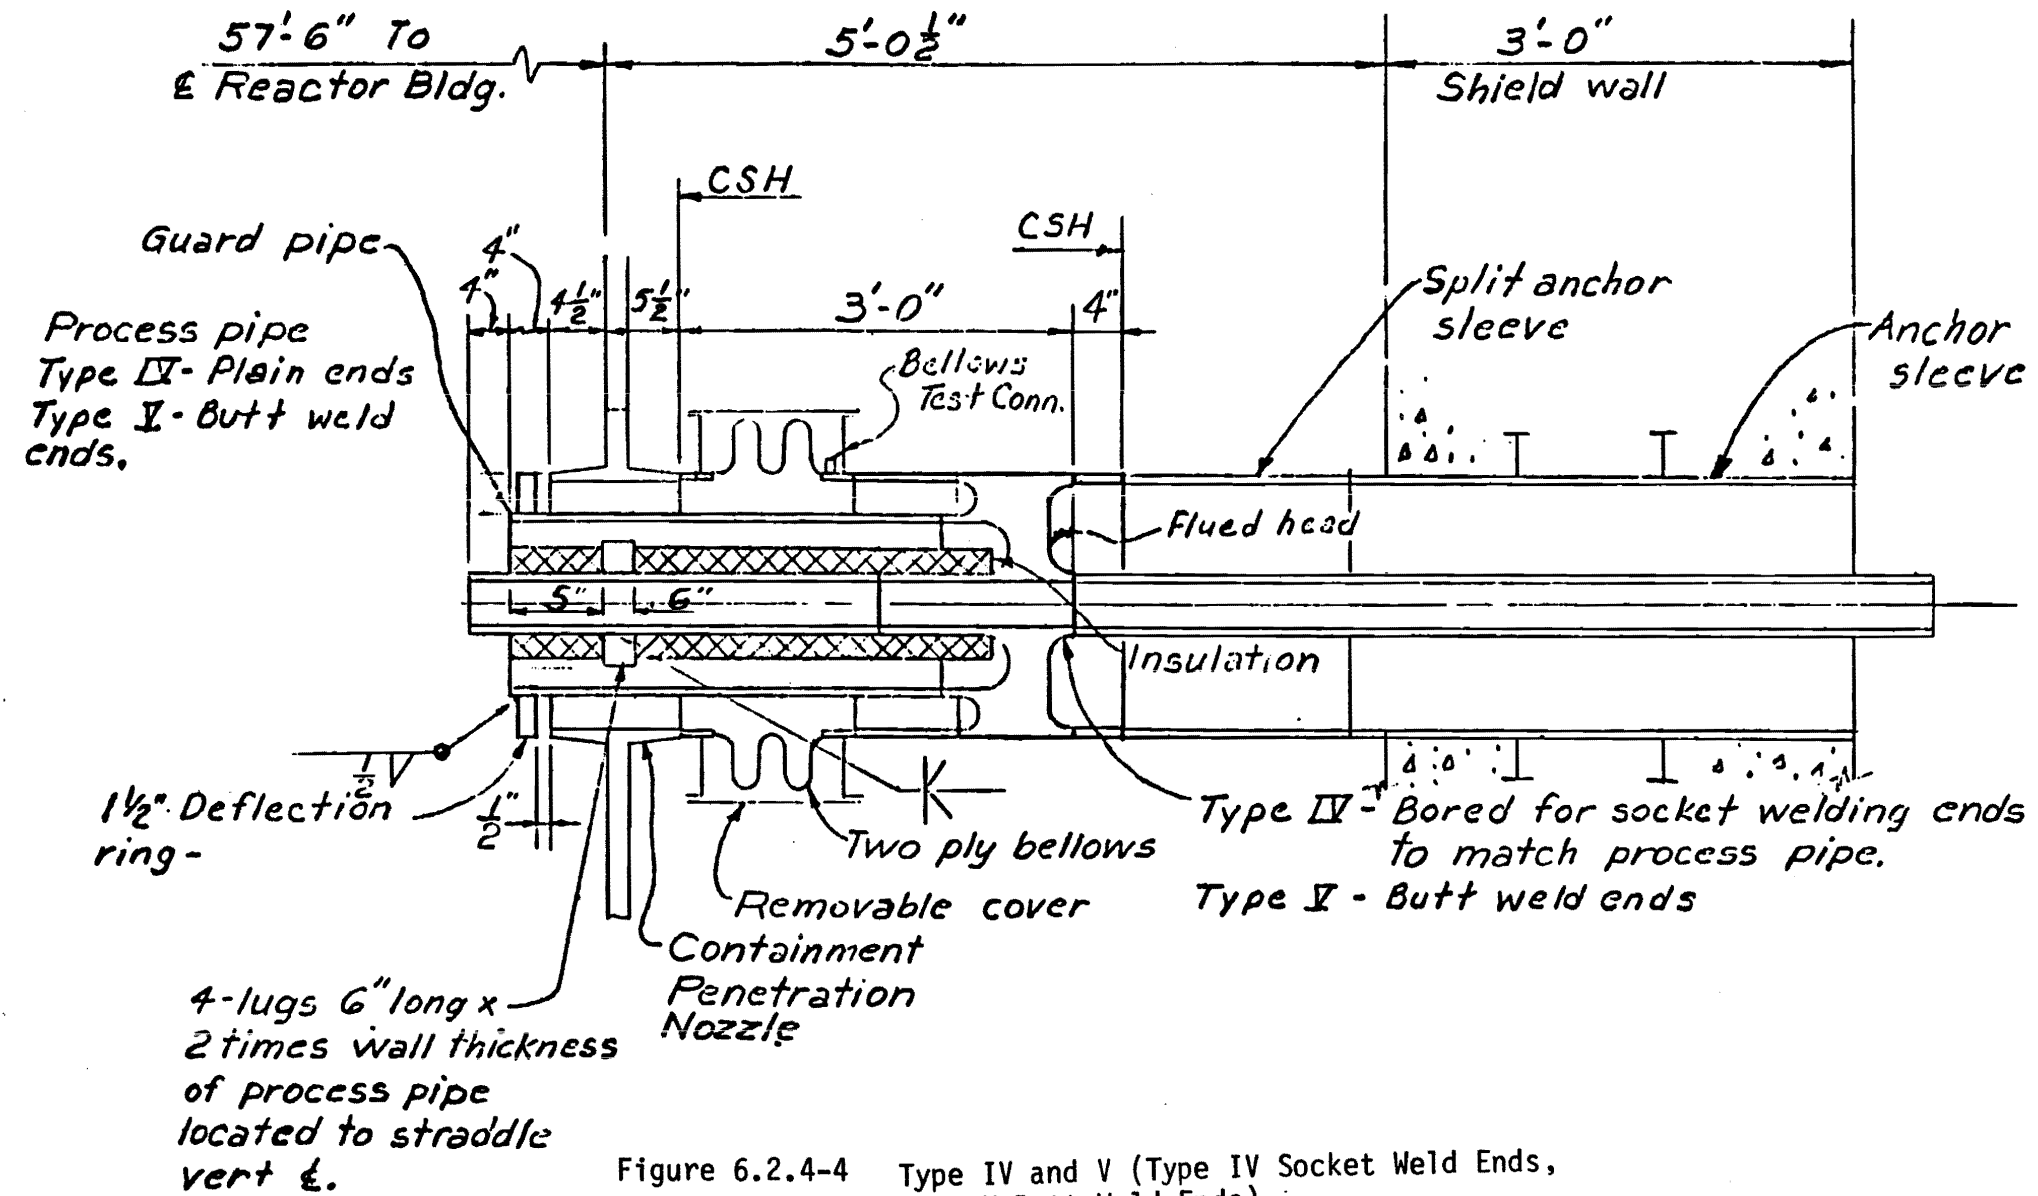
Type IV and V (Type IV Socket Weld Ends, Type V Butt Weld Ends)
